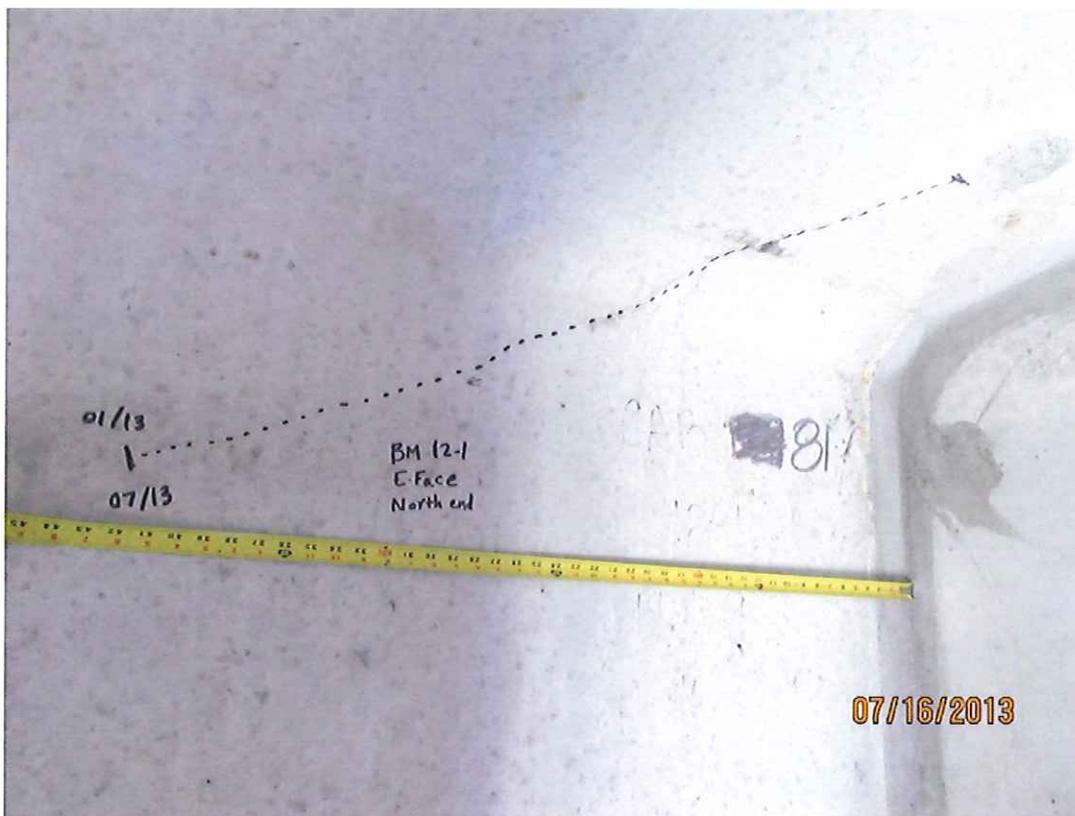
Typical diagonal crack in web and top flange extending down and away from beam end
